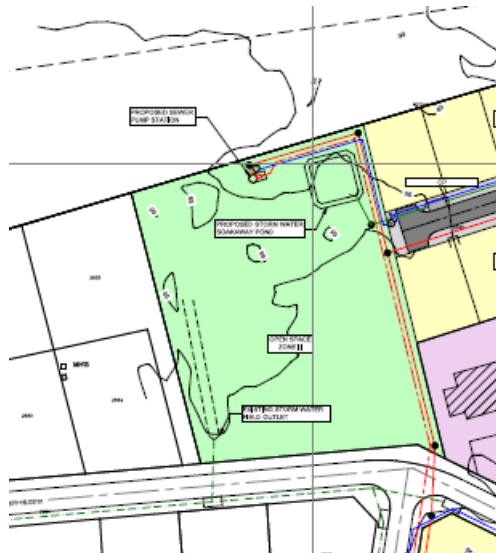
Plan to show the proposed storm water detention pond marked by the blue cross (V3 Consulting Engineers, 2025) Note that the stormwater detention pond will have to be located taking the proposed recreational facility into account.
